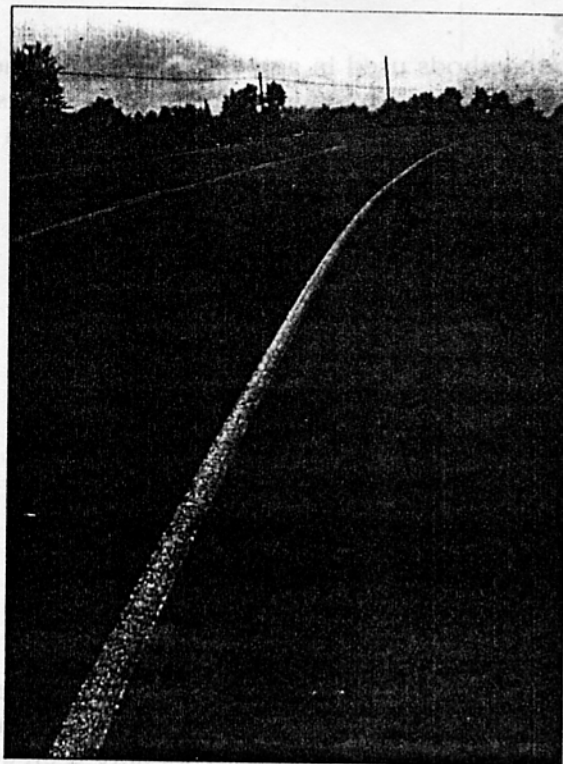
Segregated Hot Mix Asphalt Pavement
